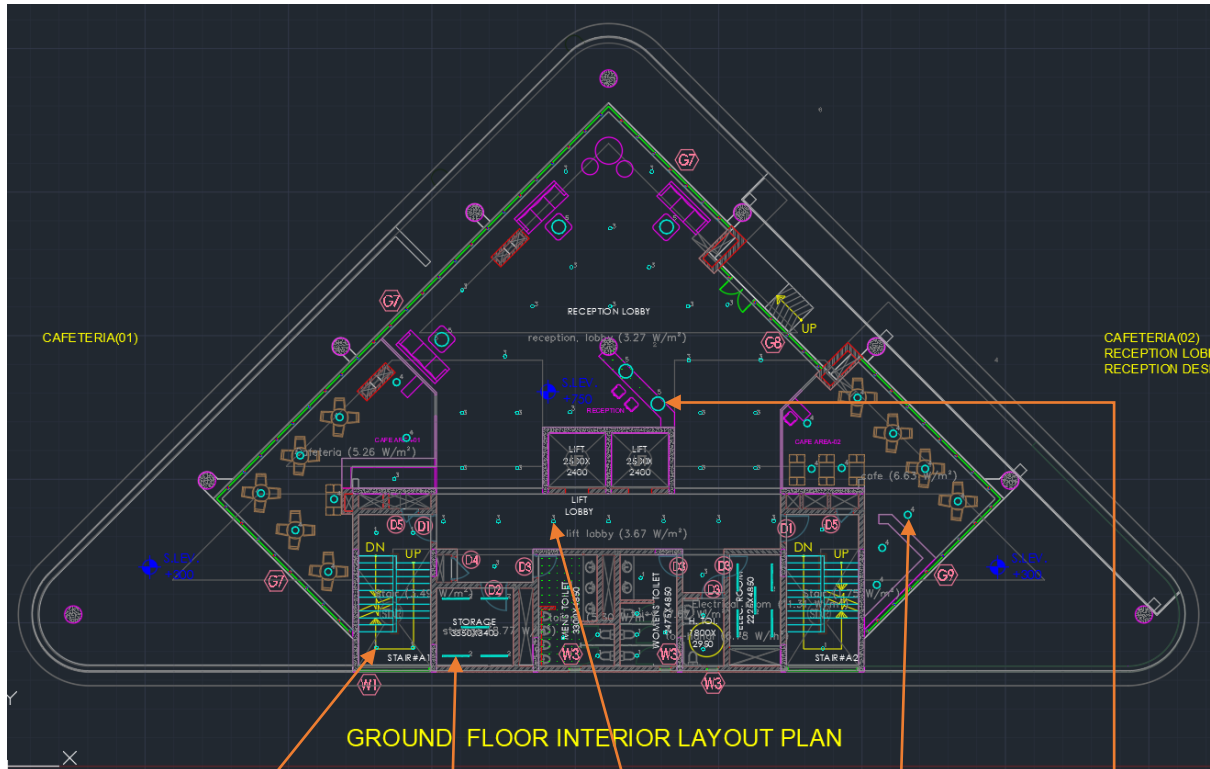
Lighting Layout of Ground Floor of GRIDCO Building
